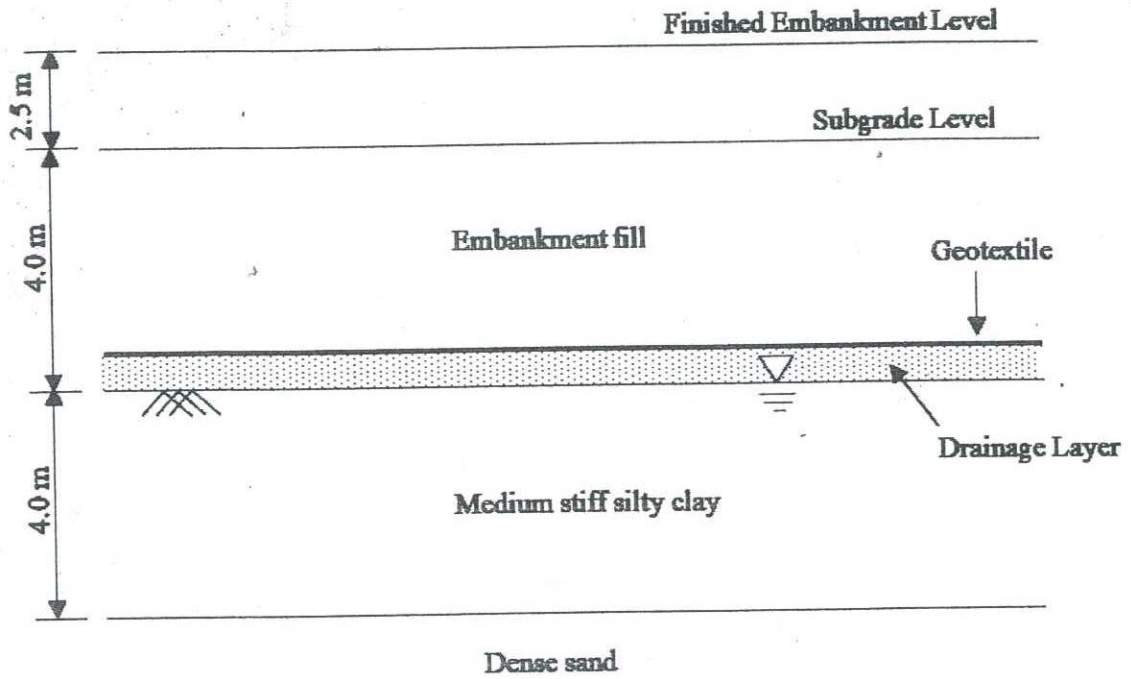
Cross section of the embankment with sub surface soil profile
